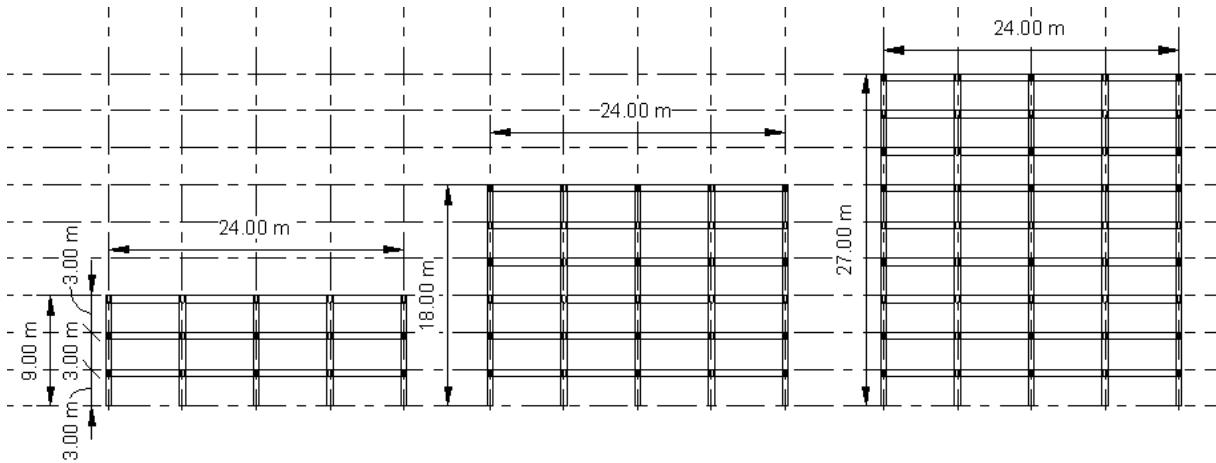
Elevation for 3,6 and 9 storey buildings.
